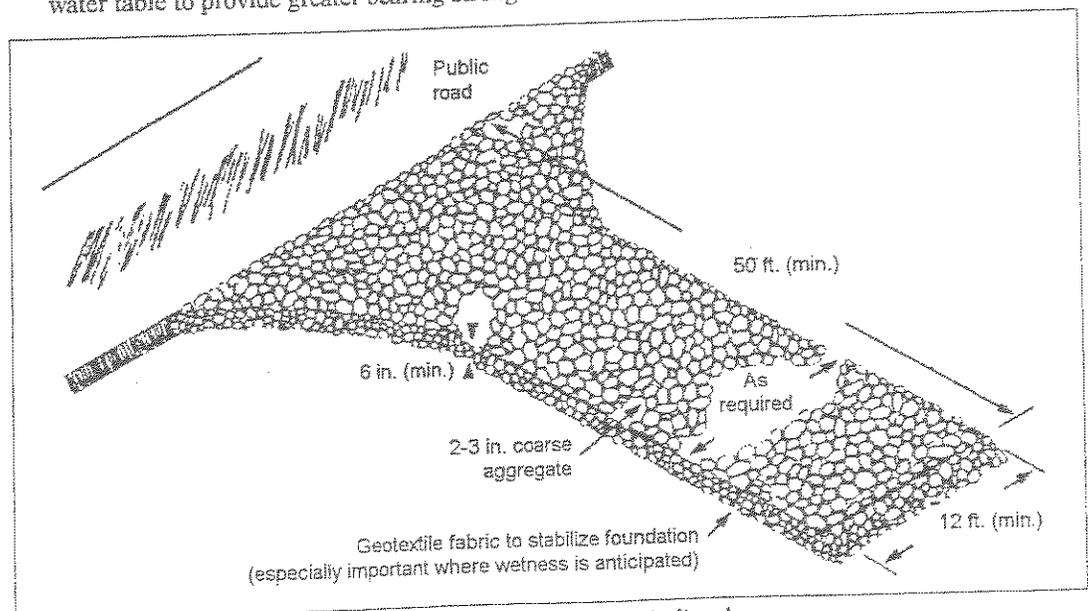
B. Plan of a temporary gravel construction entrance/exit pad.
